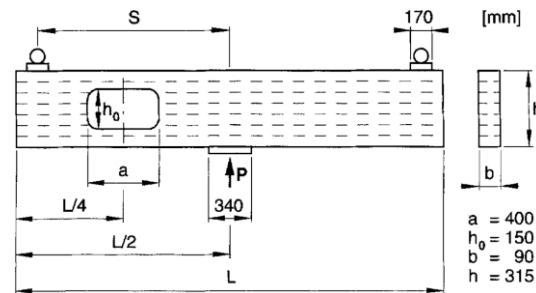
Configuration of GLT beams with rectangular holes tested by (Hallström 1996).
